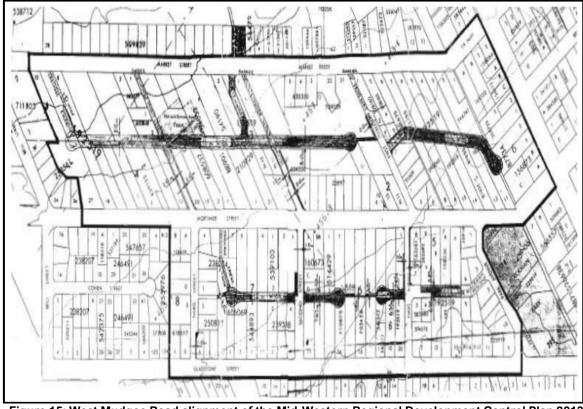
West Mudgee Road alignment of the Mid-Western Regional Development Control Plan 2013
